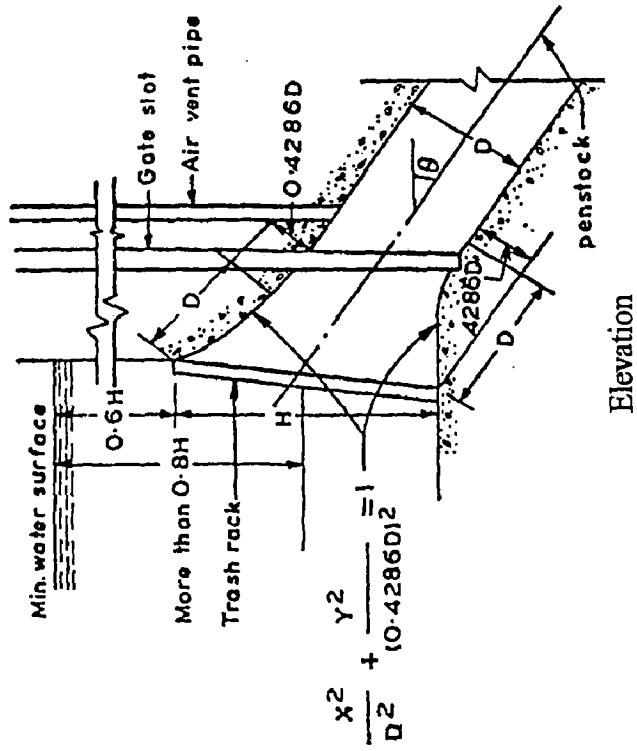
TYPICAL SECTION OF BELL MOUTH ENTRY
